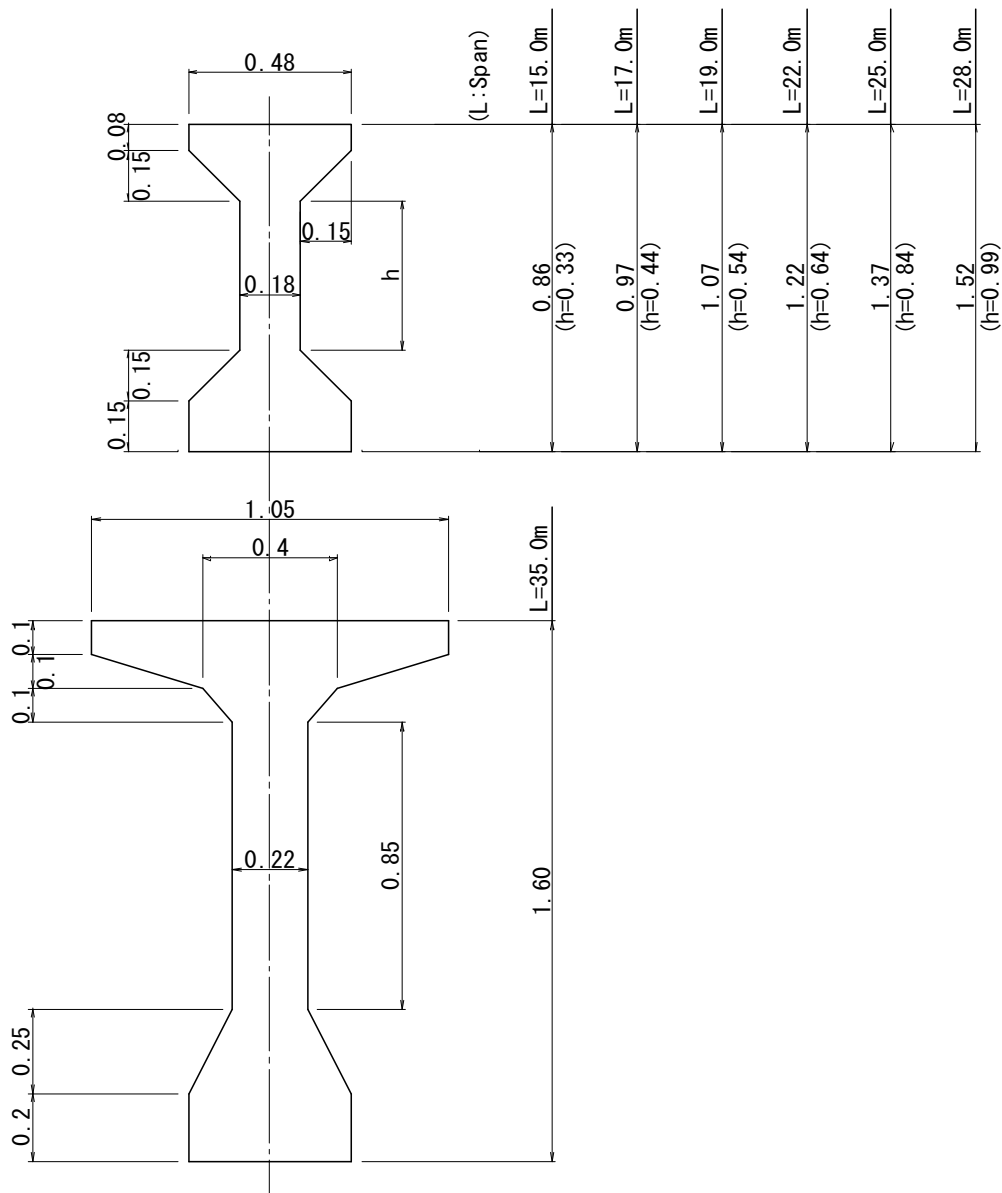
PCI Standard Bridge Beams (Costa Rica)
